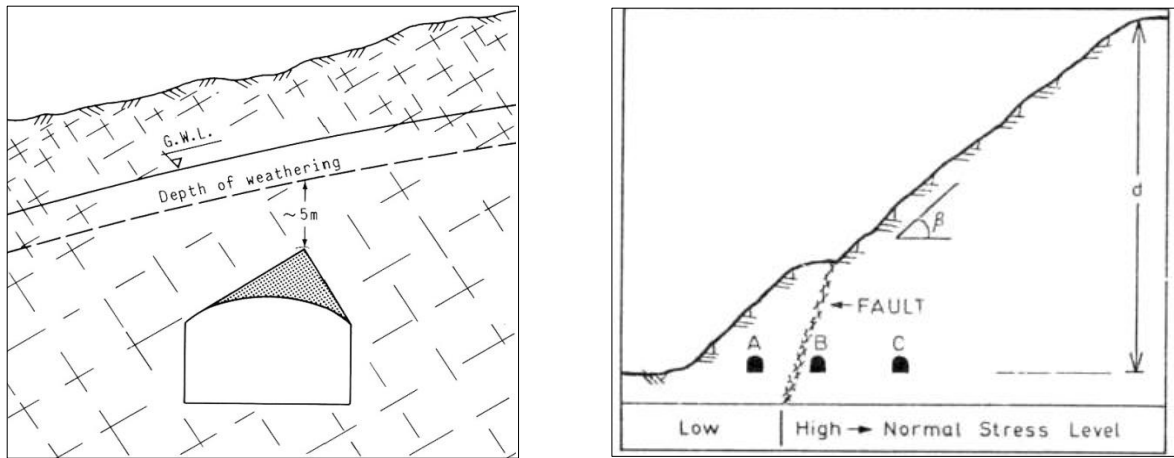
Minimum rock cover for shallow seated underground opening(left) and stress situation in valley side with fault zone (right)
